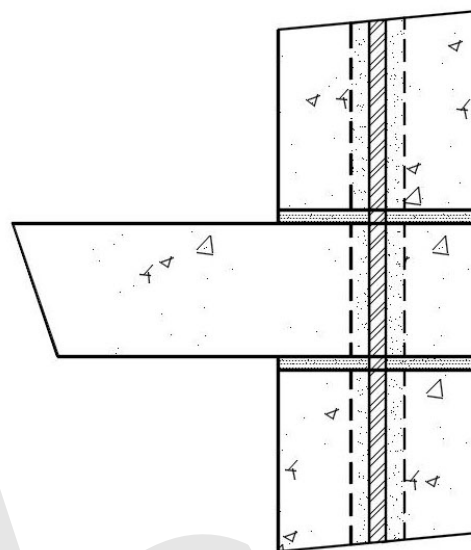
Section through precast landing bearing directly onto precast core wall with vertical continuity reinforcement grouted into cast in tubes.
